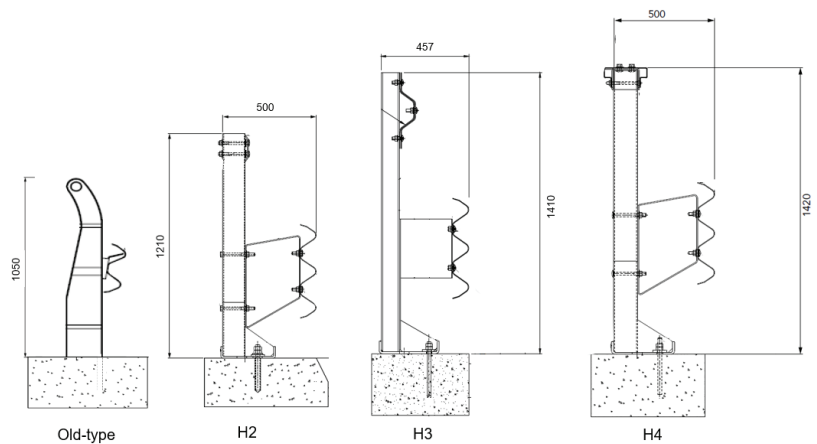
Typical old type and new H2, H3, and H4 bridge railings (dimensions in mm).
